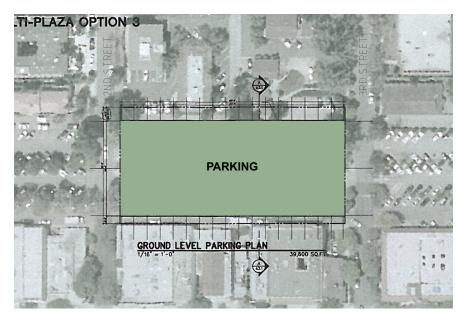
Public-Private Test Case C—Plan of Public Parking Structure on Plaza 7
